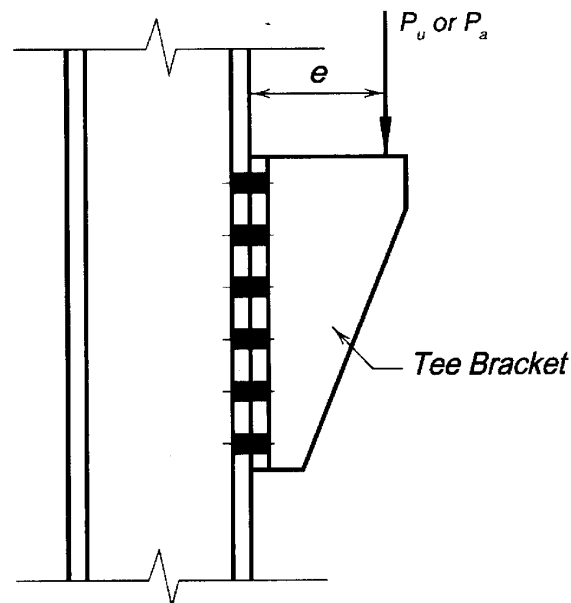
Tee bracket subject to eccentric loading normal to the plane of the faying surface.
